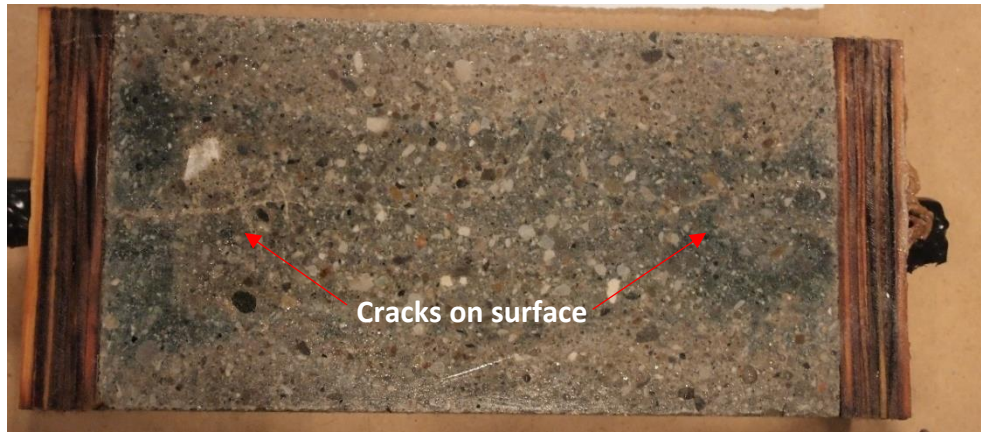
Specimen PKSB-iv with cracks at the bottom of the ponding well. Walls of the well had been removed
